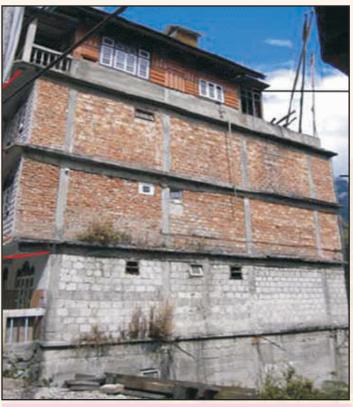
Typical hybrid infill RC construction in Lachung (Sikkim)
